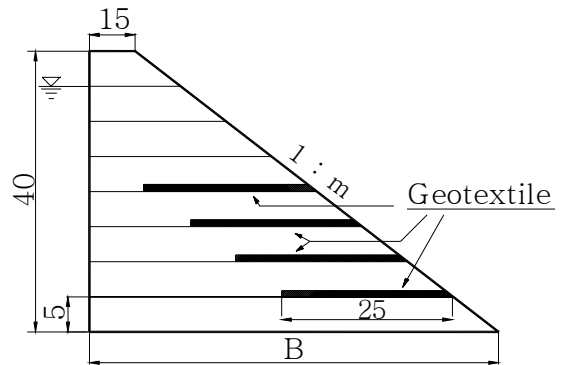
Reinforced embankment with geotextile (unit : cm)
